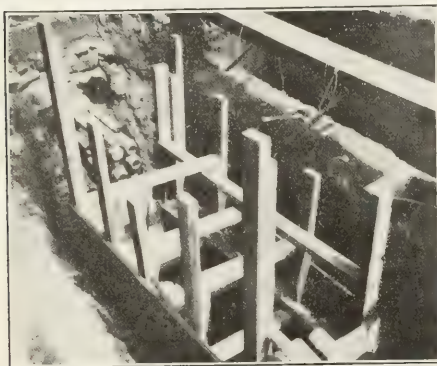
CONSTRUCTING FORM FOR MANHOLE
